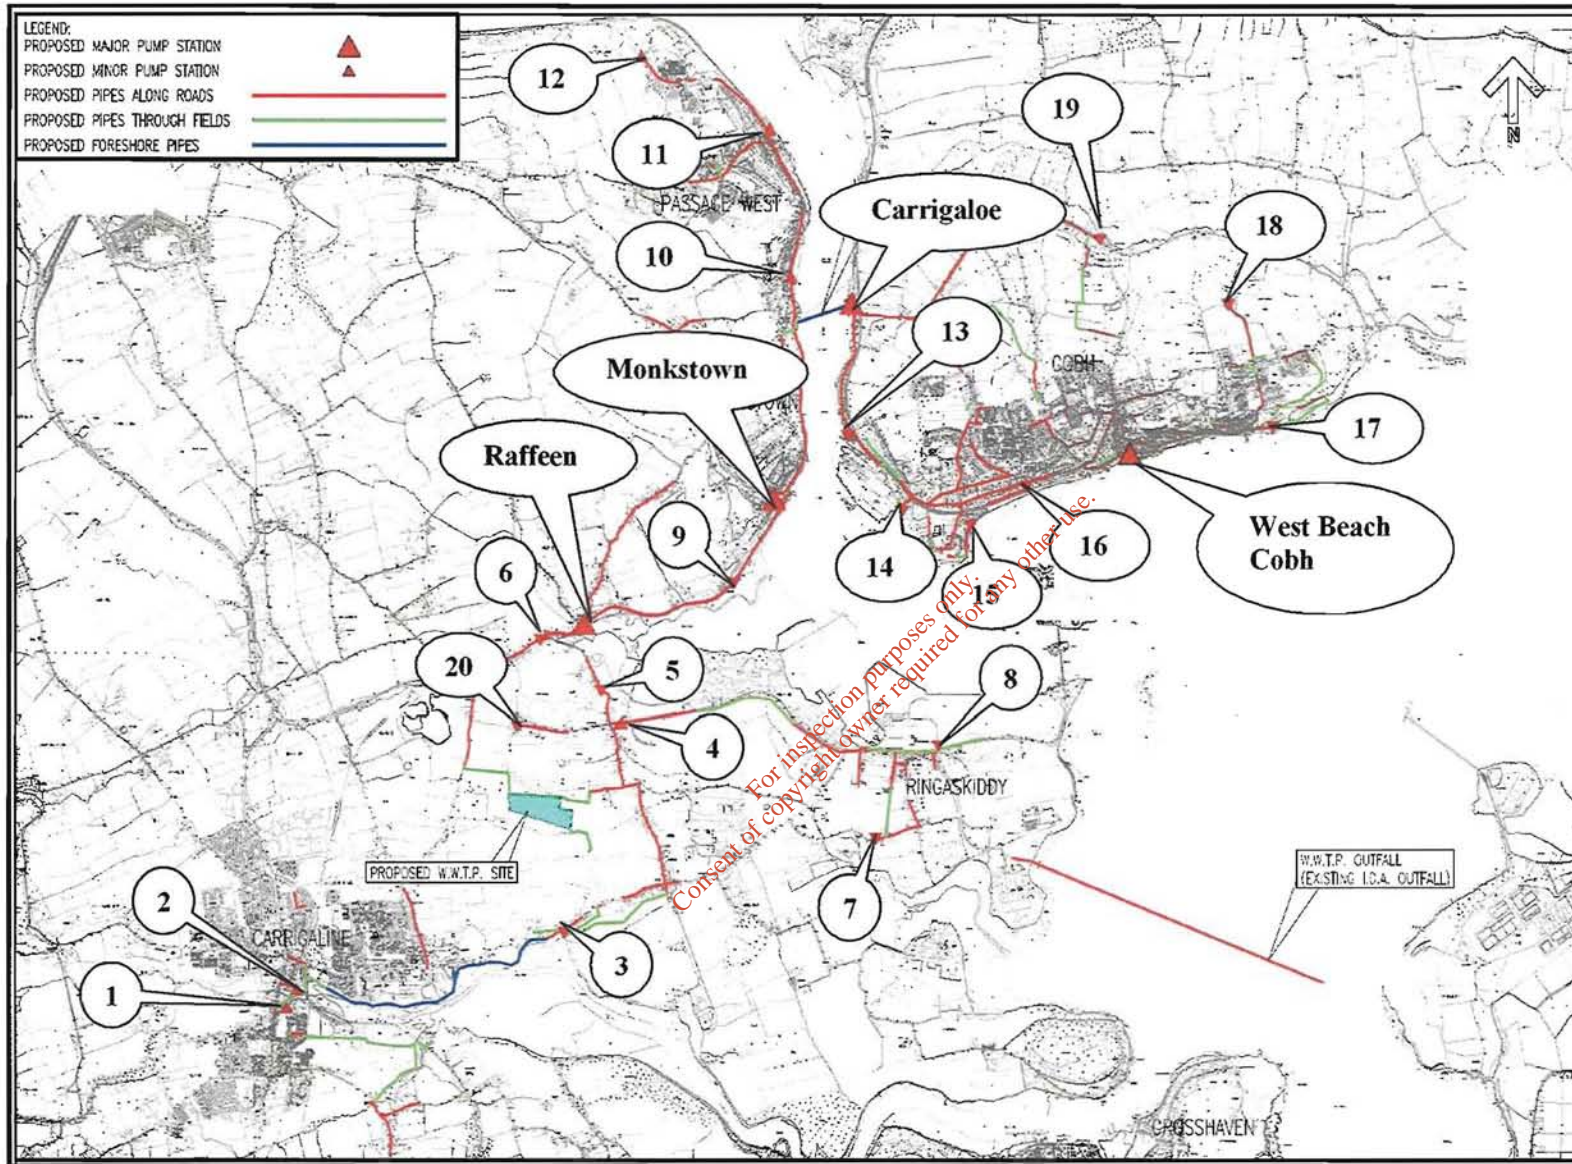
LAYOUT OF CORK HARBOUR MAIN DRAINAGE SCHEME, PUMPING STATION LOCATIONS
